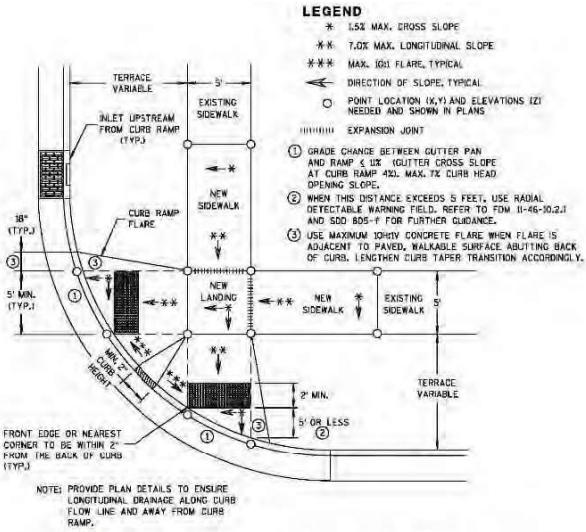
Typical Type 2 Curb Ramp Installation with Recommended Plan Details
